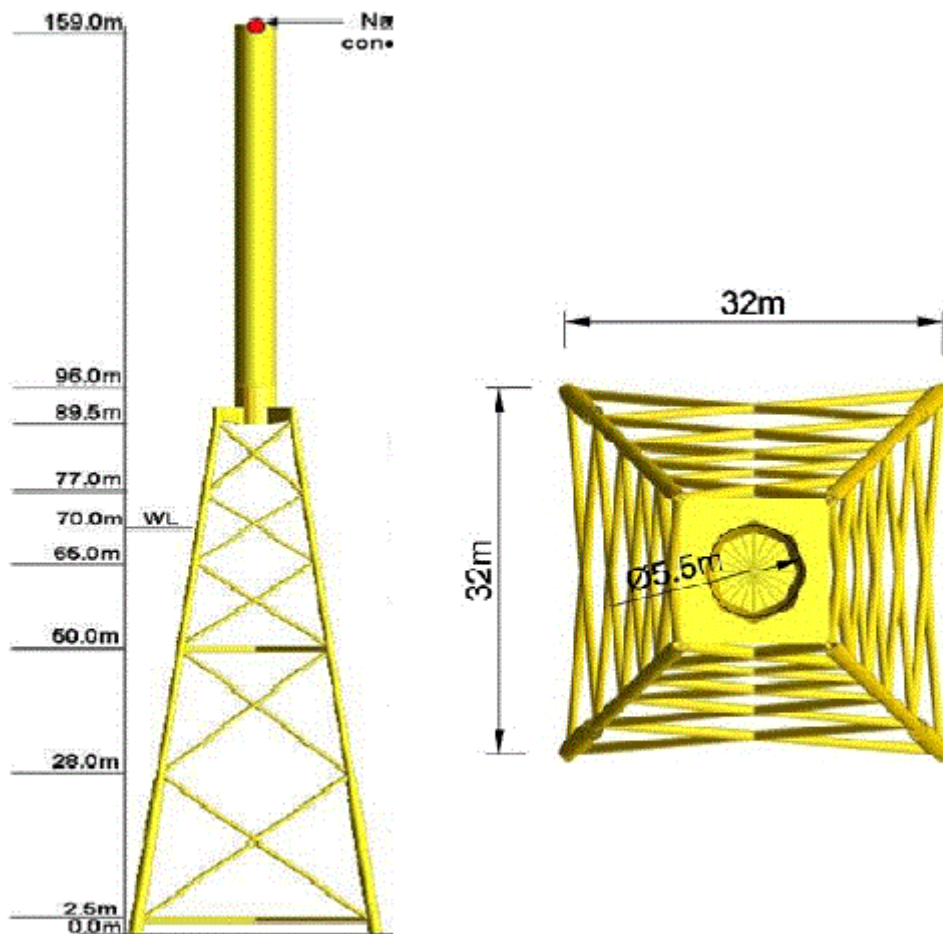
Main Dimension of the 70m water-depth jacket substructure
